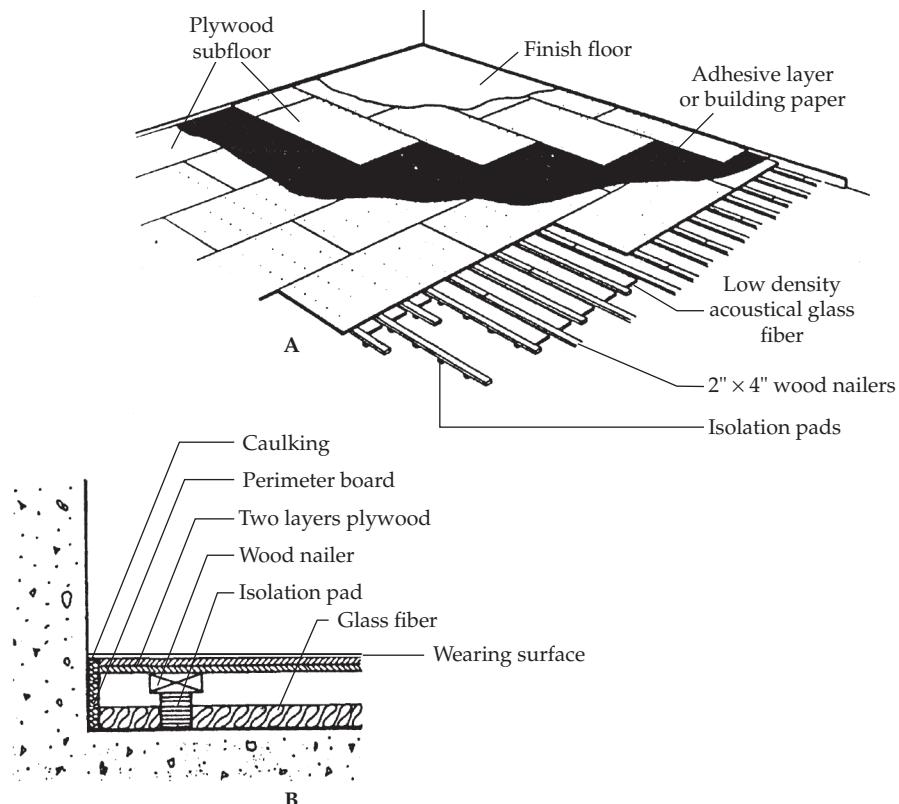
Example of a wood floating floor construction. (A) Overall floor assembly. (B) Detail of floor perimeter. (*Kinetics Noise Control*.)
